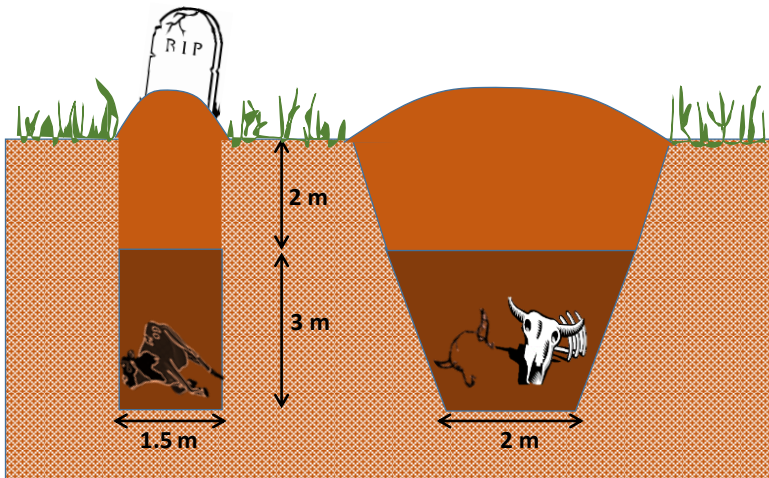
Trench (left) and Battered (right) burial pits. The latter is used to prevent fragile walls from collapsing.
